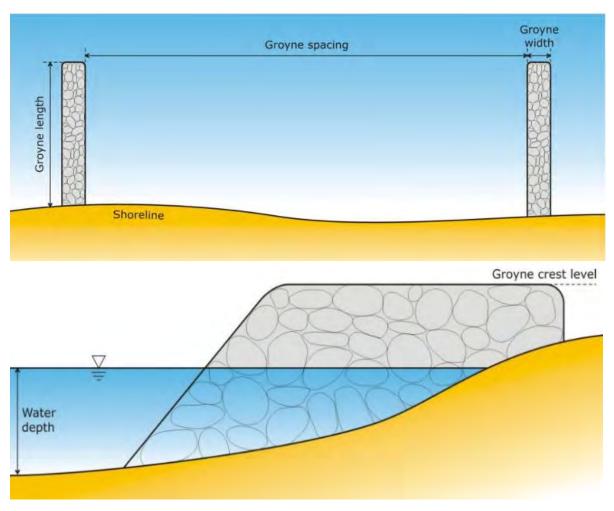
Groyne field design parameters, plan (above) and profile views (below). (Source: WRL, 2013).
